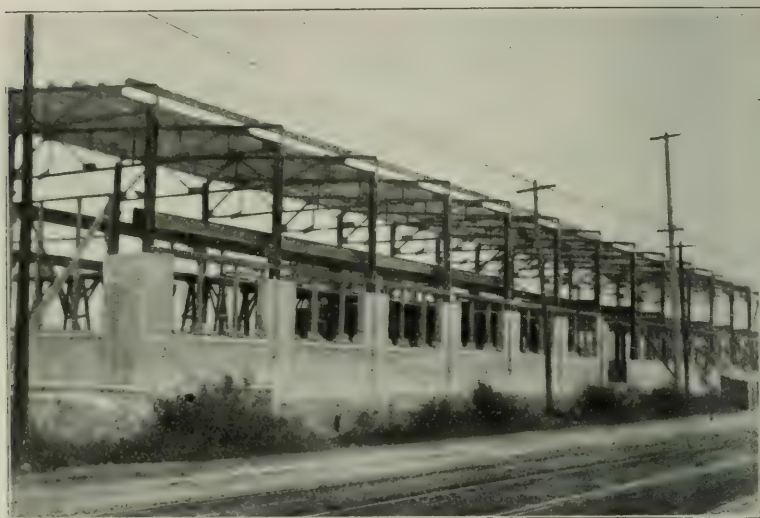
View of Building With Self-Supporting Steel Frame Work—During Construction.
